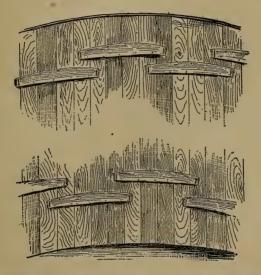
Shows how barrel staves may be used in setting up a silo. They should be removed before the silo is filled.
